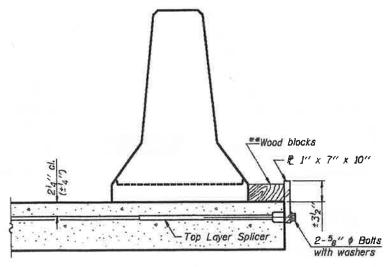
Illinois' block-out with edge-of-deck bracket Source: IL DOT R27
